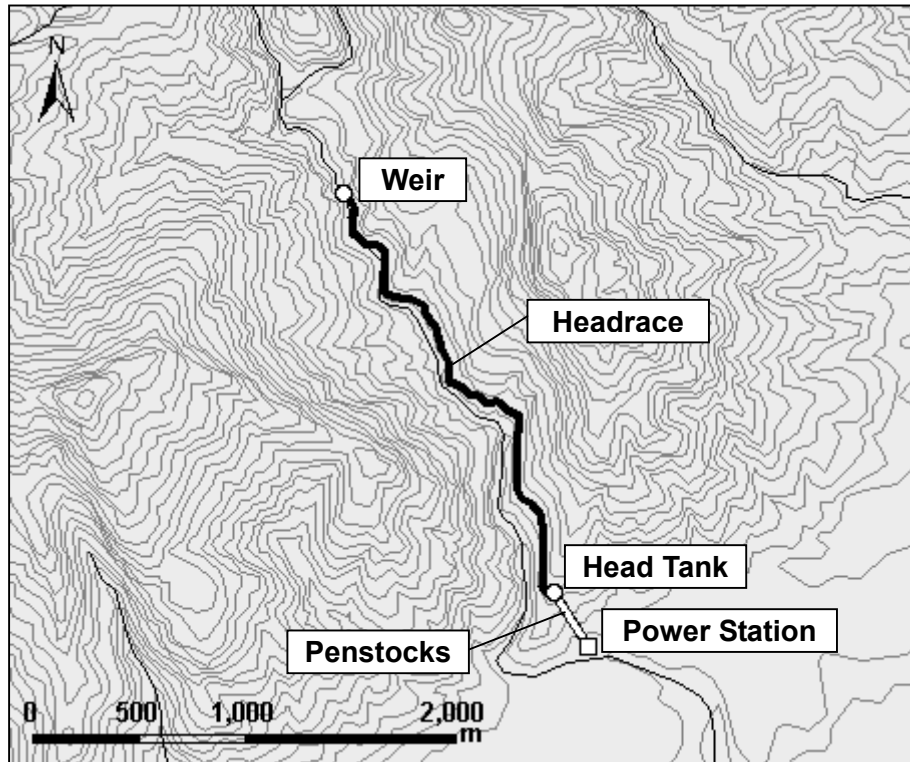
Civil Structure Arrangement at Talakaigan Potential Site
